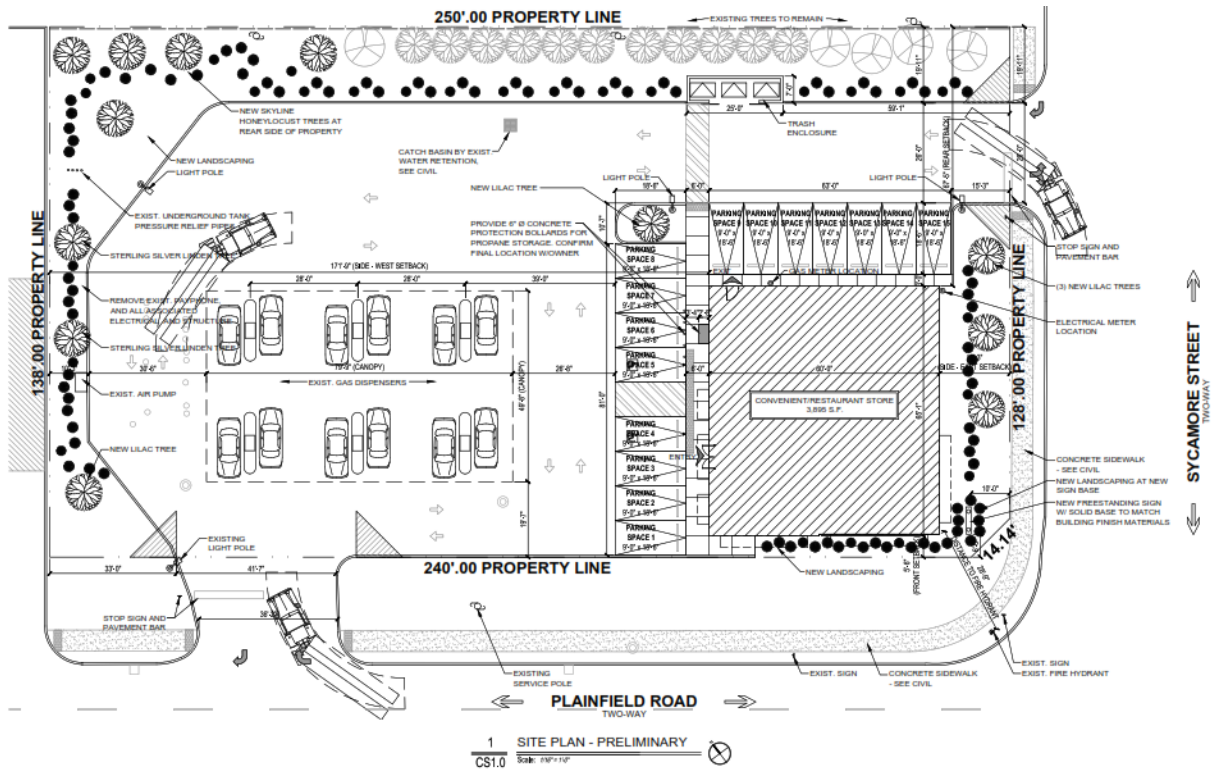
Proposed Rendering for Redevelopment of 2350 Plainfield Road (Shell)
